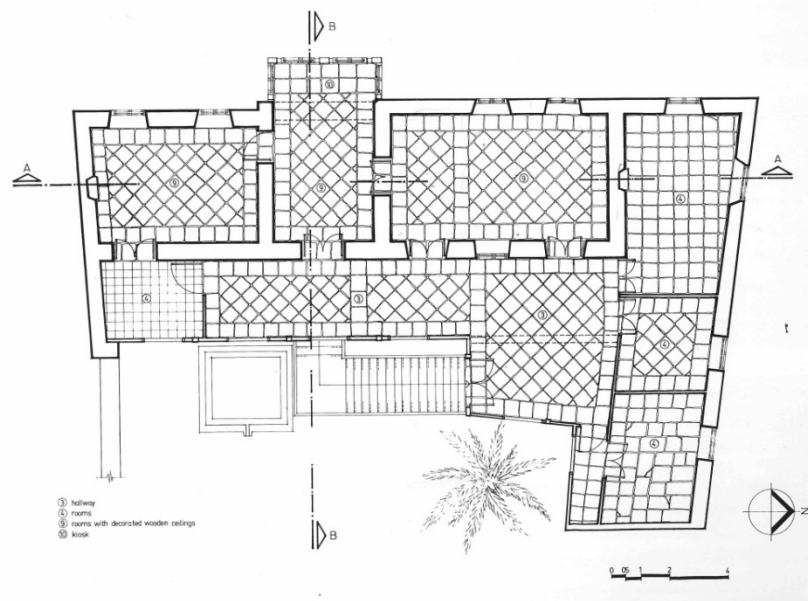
Floor covering by local marble plaques (Anonymous, 1995)
